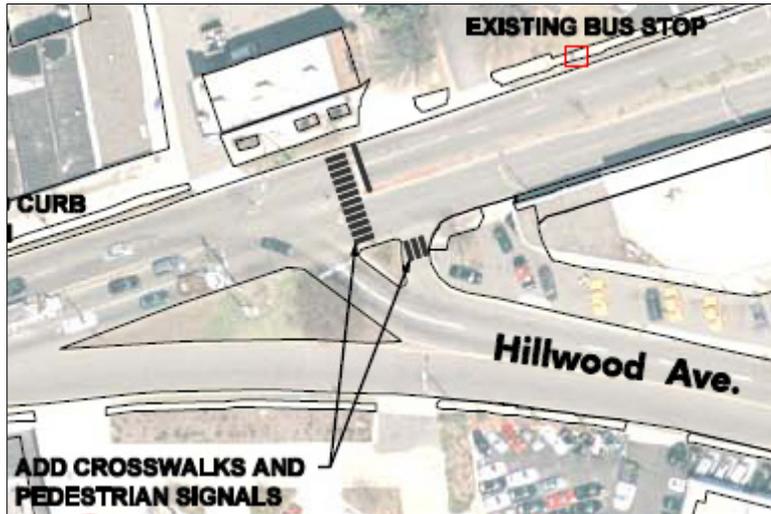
Short-term Recommendations for Hillwood Ave. Intersection
